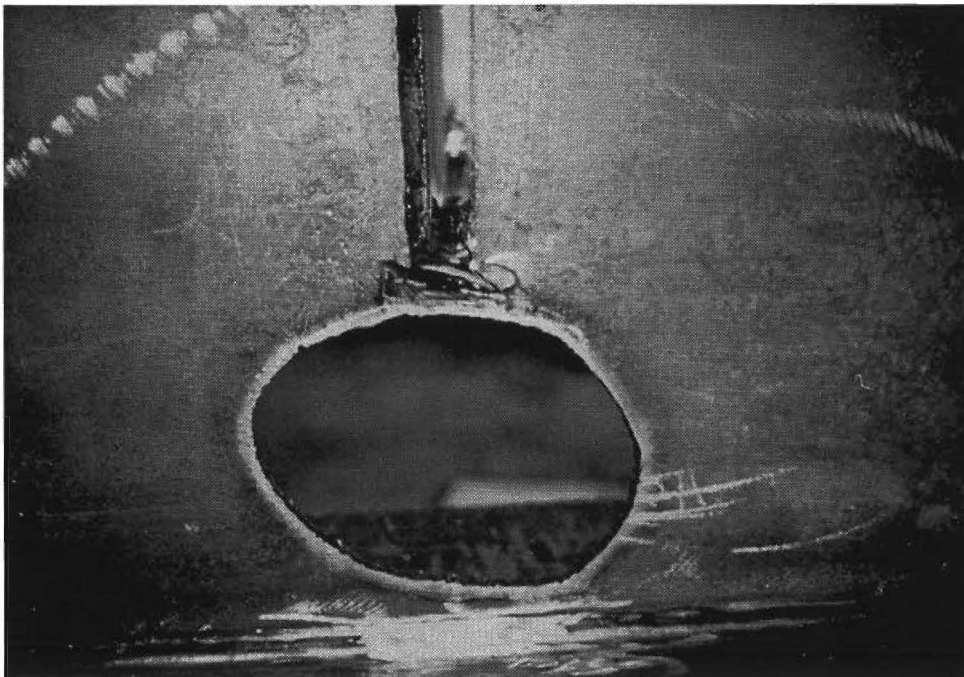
Flame-cut hole in web plate at Stiffener 1-1.
